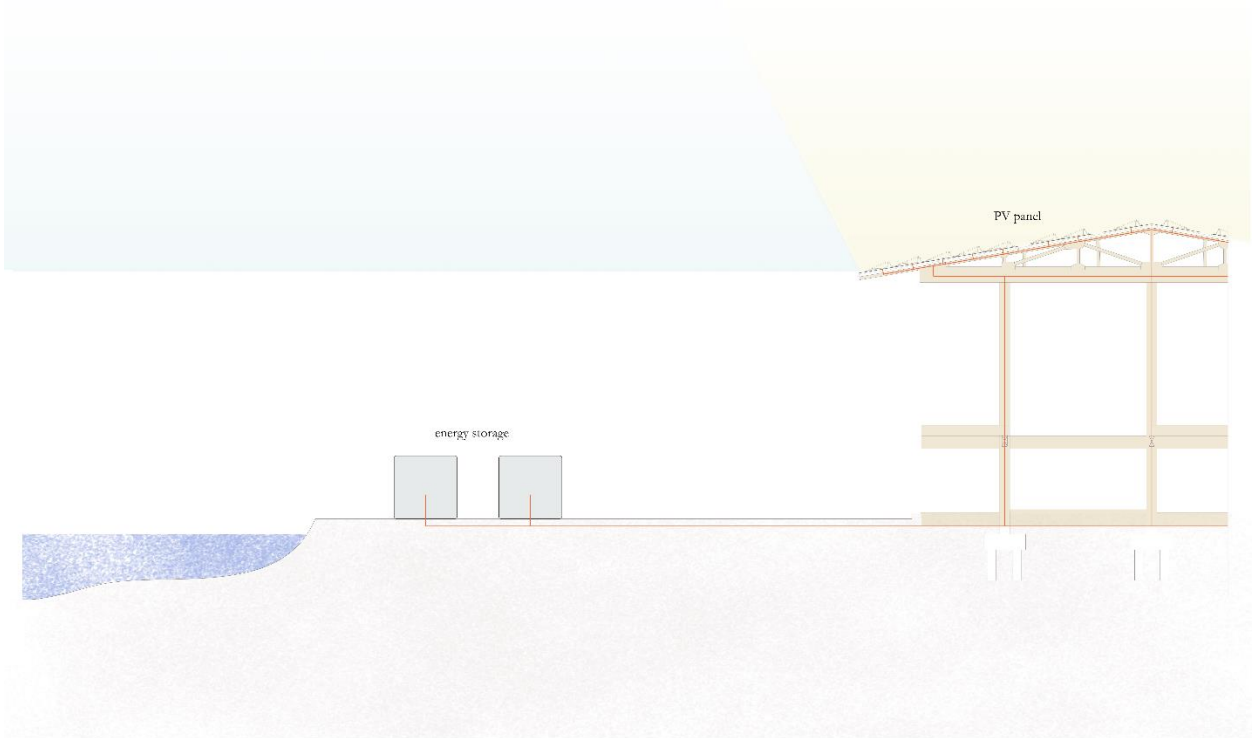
Schematic Design for Solar Panel Roof Work
